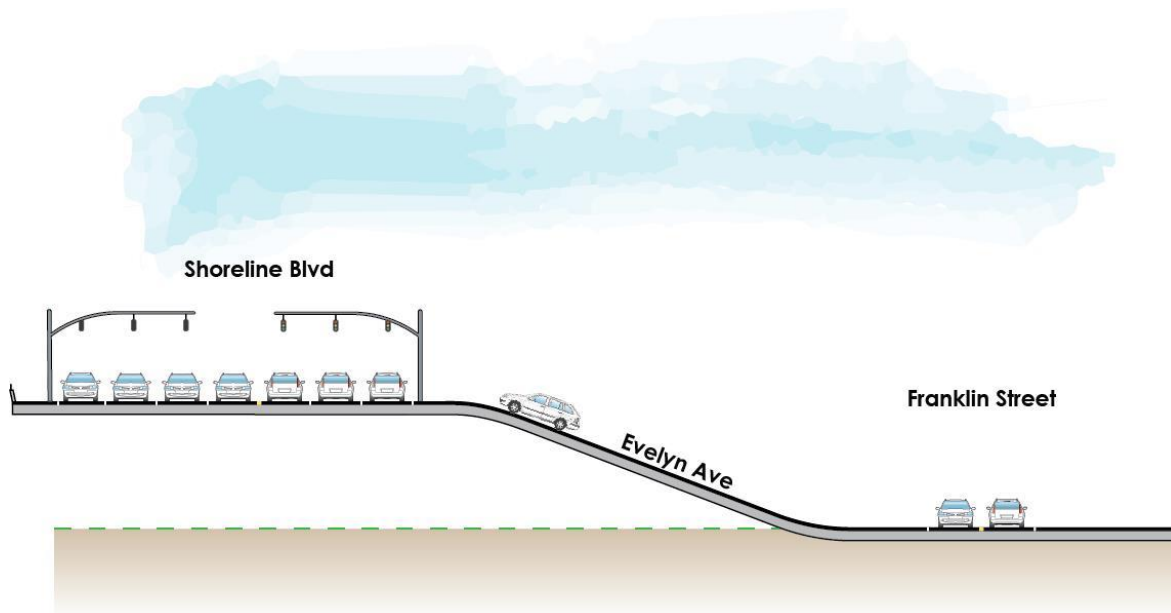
Alternative 4: Shoreline Boulevard Ramp Connector
